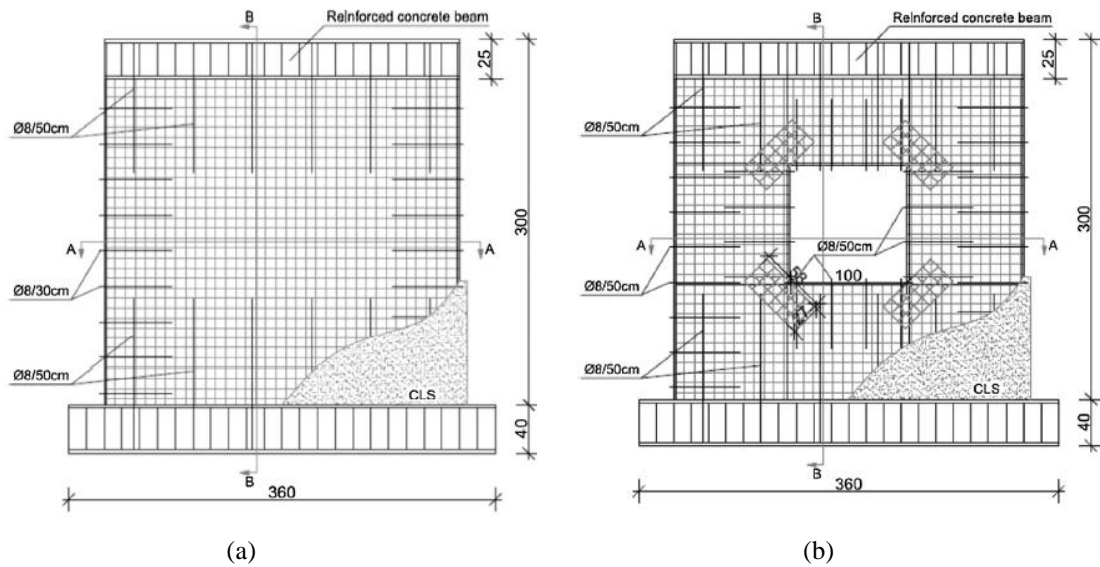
(a) Reinforcement layout for the full planar wall; (b) Reinforcement layout for the planar wall with the central opening
